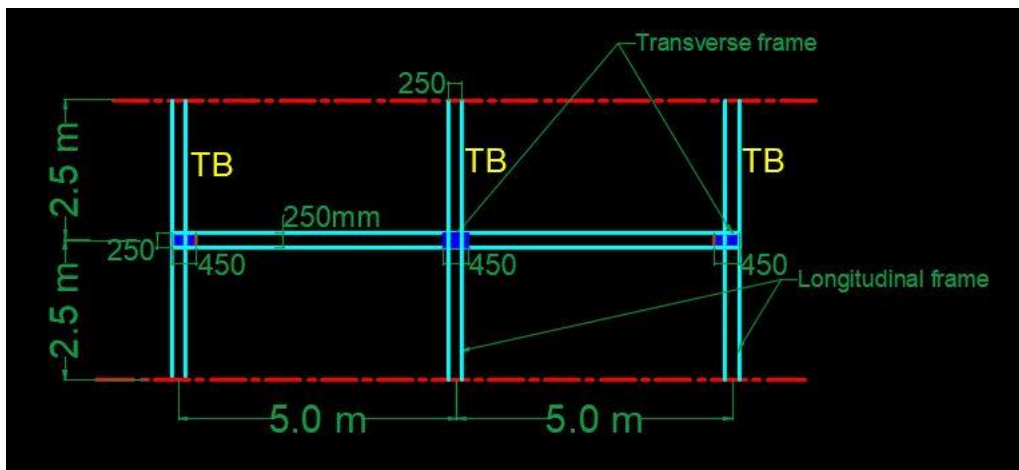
Plan showing the Columns and Beams at "Floor" of the Plane Frame
